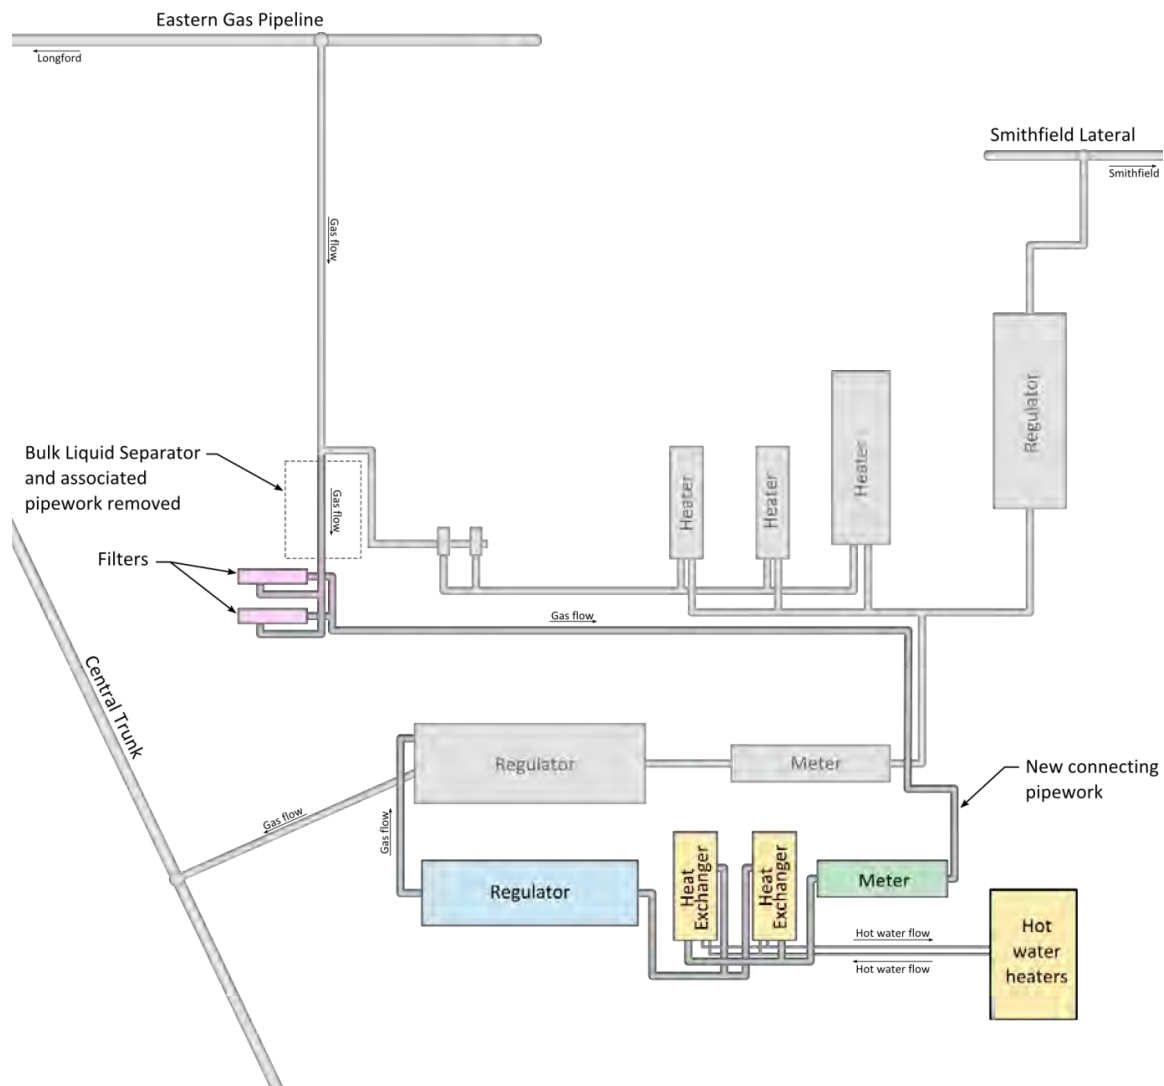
Schematic of the additional apparatus and pipework to be installed as part of the proposal
